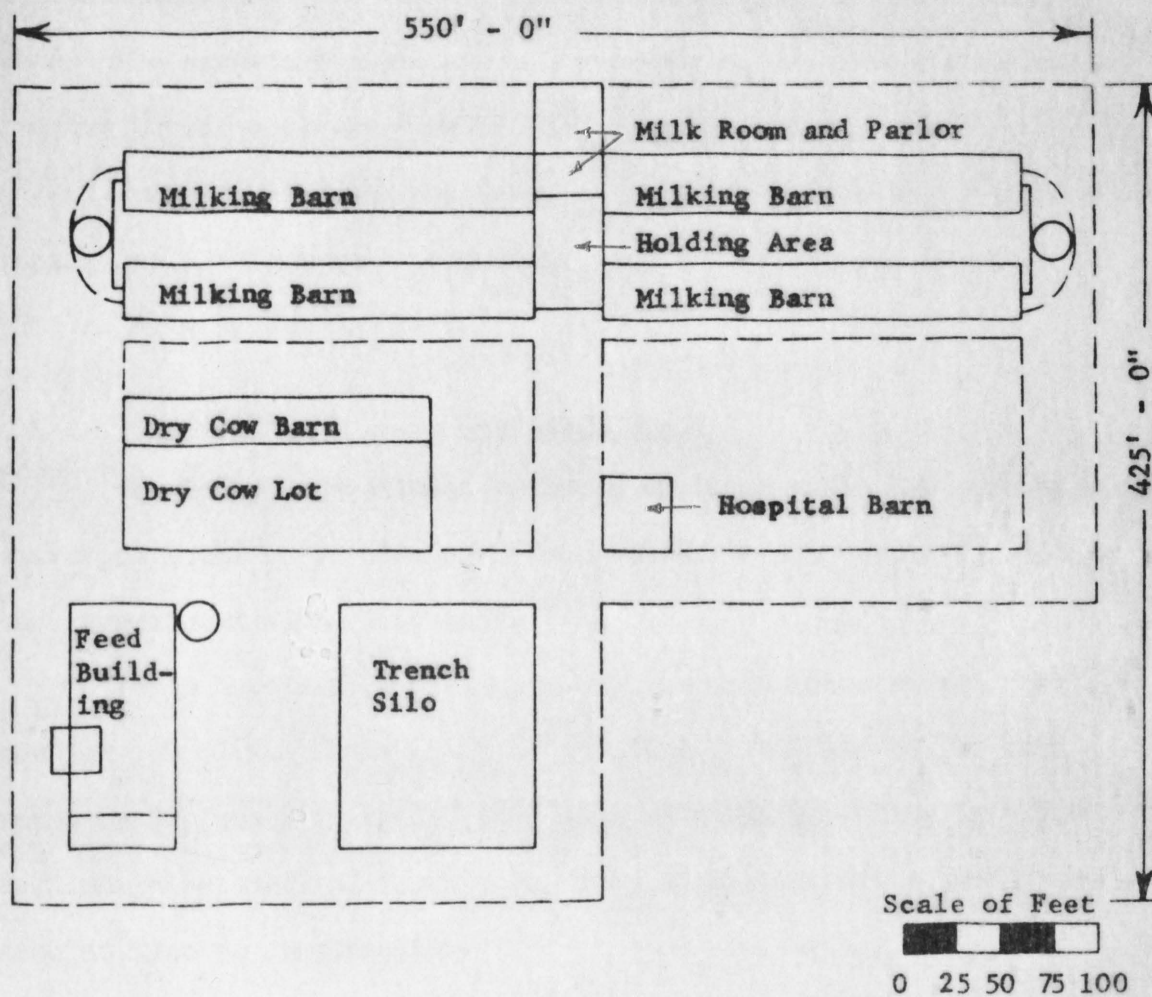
Figure I. Proposed Layout For 480 Cow Dairy Herd - Stanchion Barns
